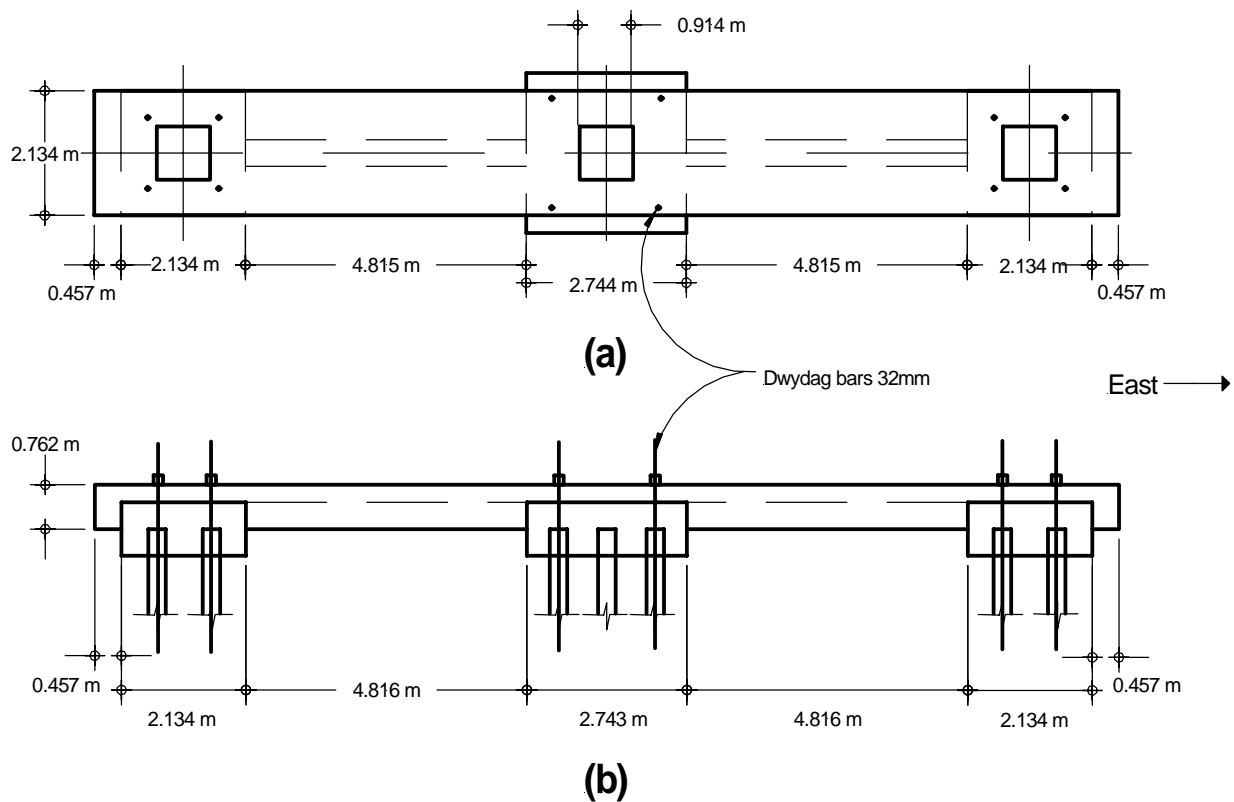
As-built substructure of Bent #4S (2000): (a) plan, (b) elevation
